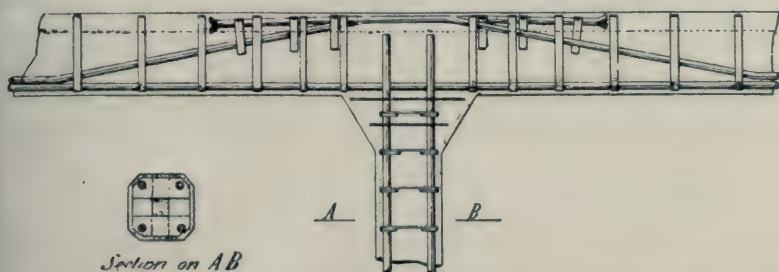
Connection of a Continuous Girder to a Column. Hennibique cols. and beams.
